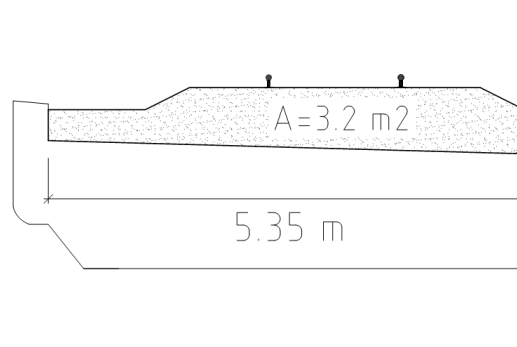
Half of the cross-section of the bridge deck of the slab bridges.
